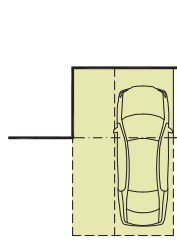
TOWNHOUSE, ROSSMÄSSLERSTRASSE, LEIPZIG, GERMANY.
